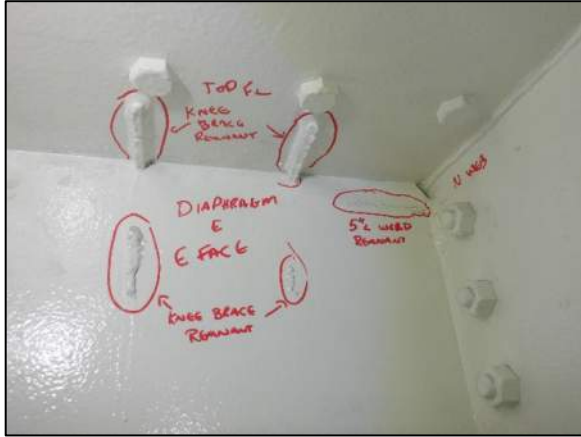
East Face of Girder E Diaphragms and Top Flange; Knee Brace Remnants And 5" L Weld Remnants
